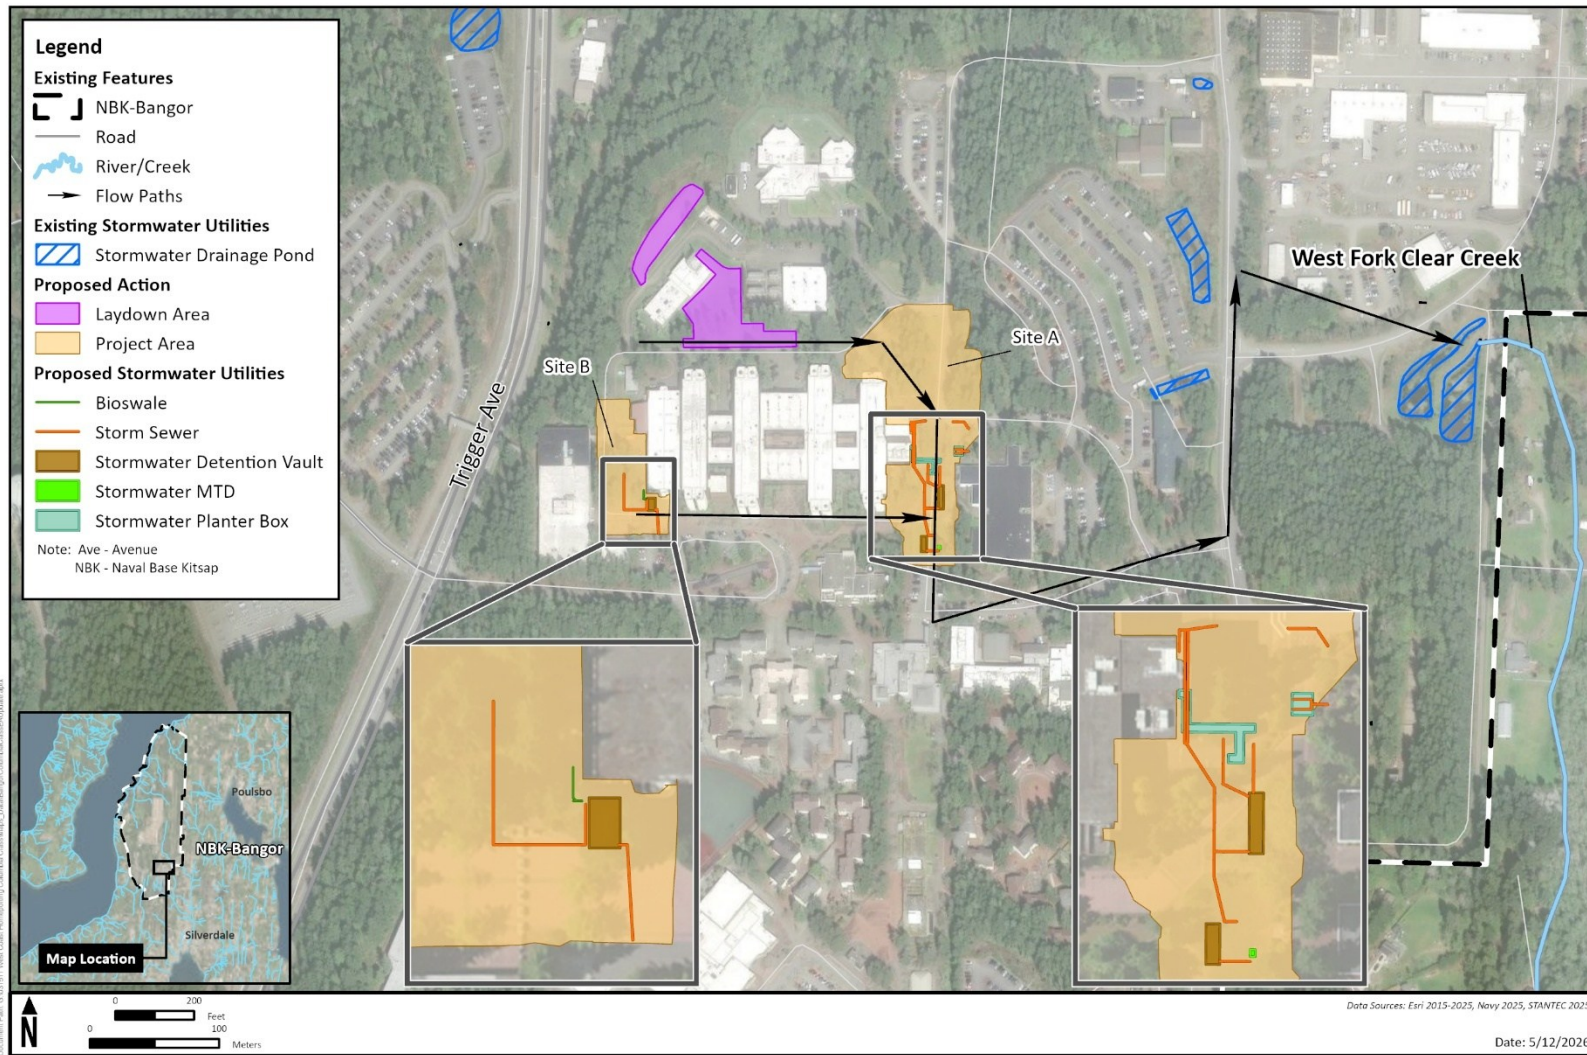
Proposed Stormwater Upgrades for Upland Site-South
